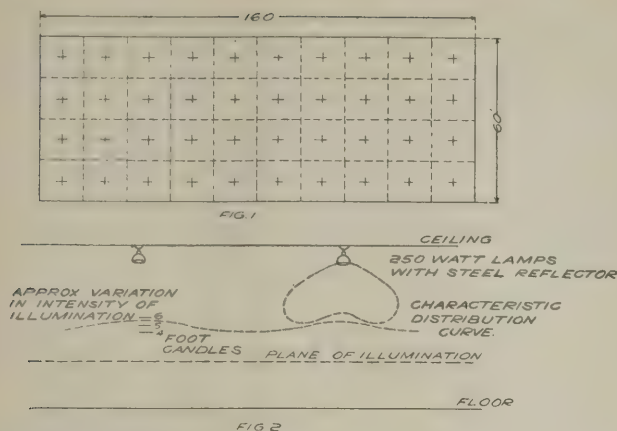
LIGHTING LAYOUT FOR COTTON MILL WEAWE ROOM.
